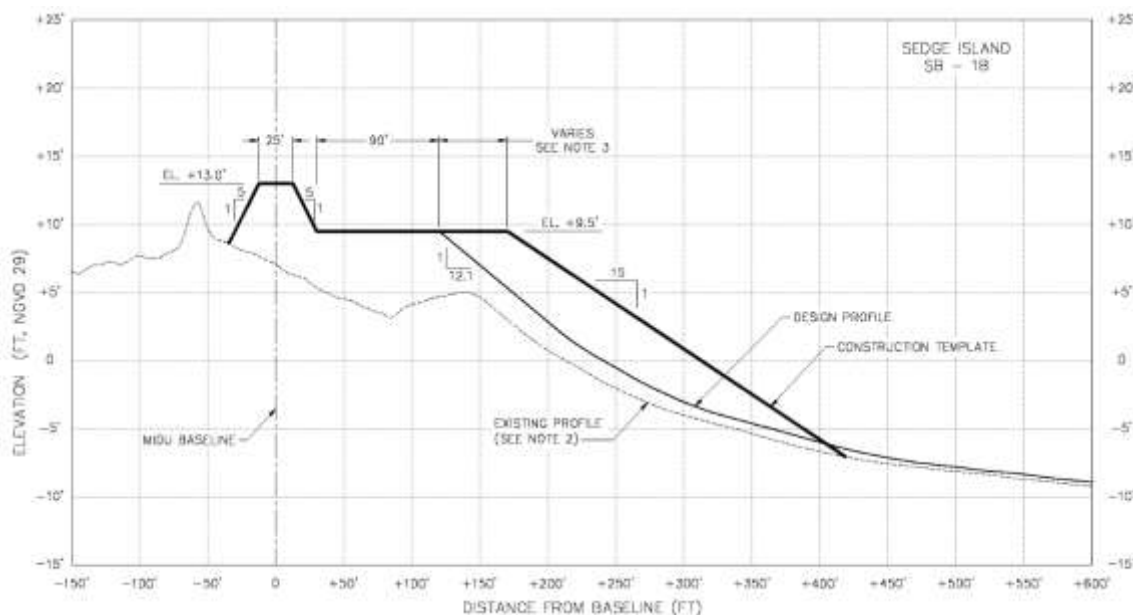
Typical Proactive BRP Section (notes are included in the Plates Appendix)
